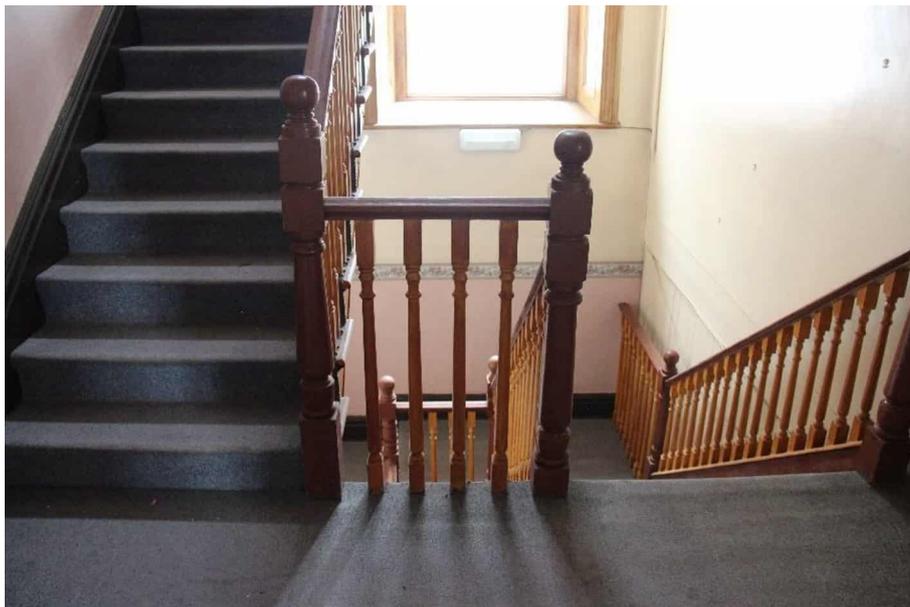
Decorative newels and timber wainscoting to Return level or main staircase.
